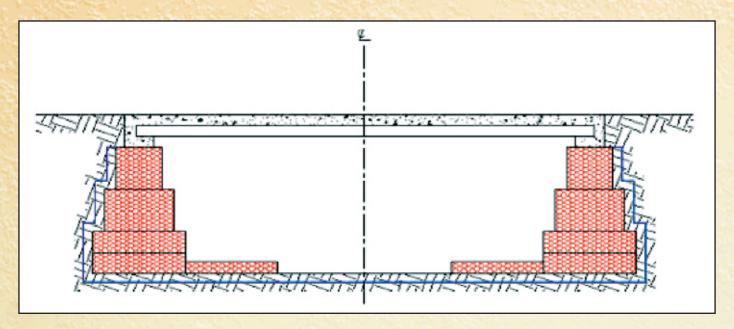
Typical scheme of minor bridge protection with Gabion retaining wall
